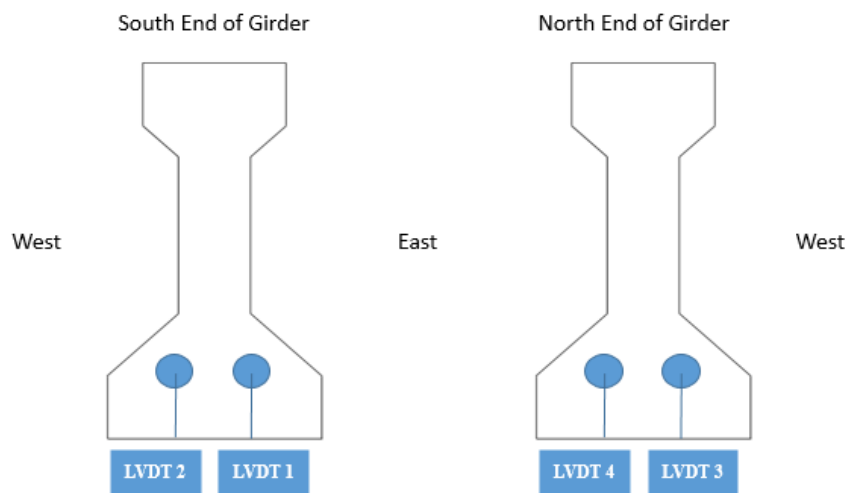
Location of LVDTs on prestressing strands at the girder ends during shear testing
